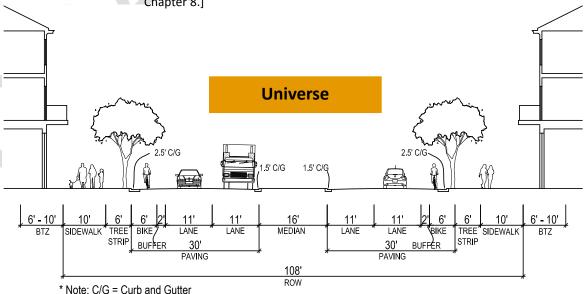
Street Type 8: Universe Boulevard Cross Section
